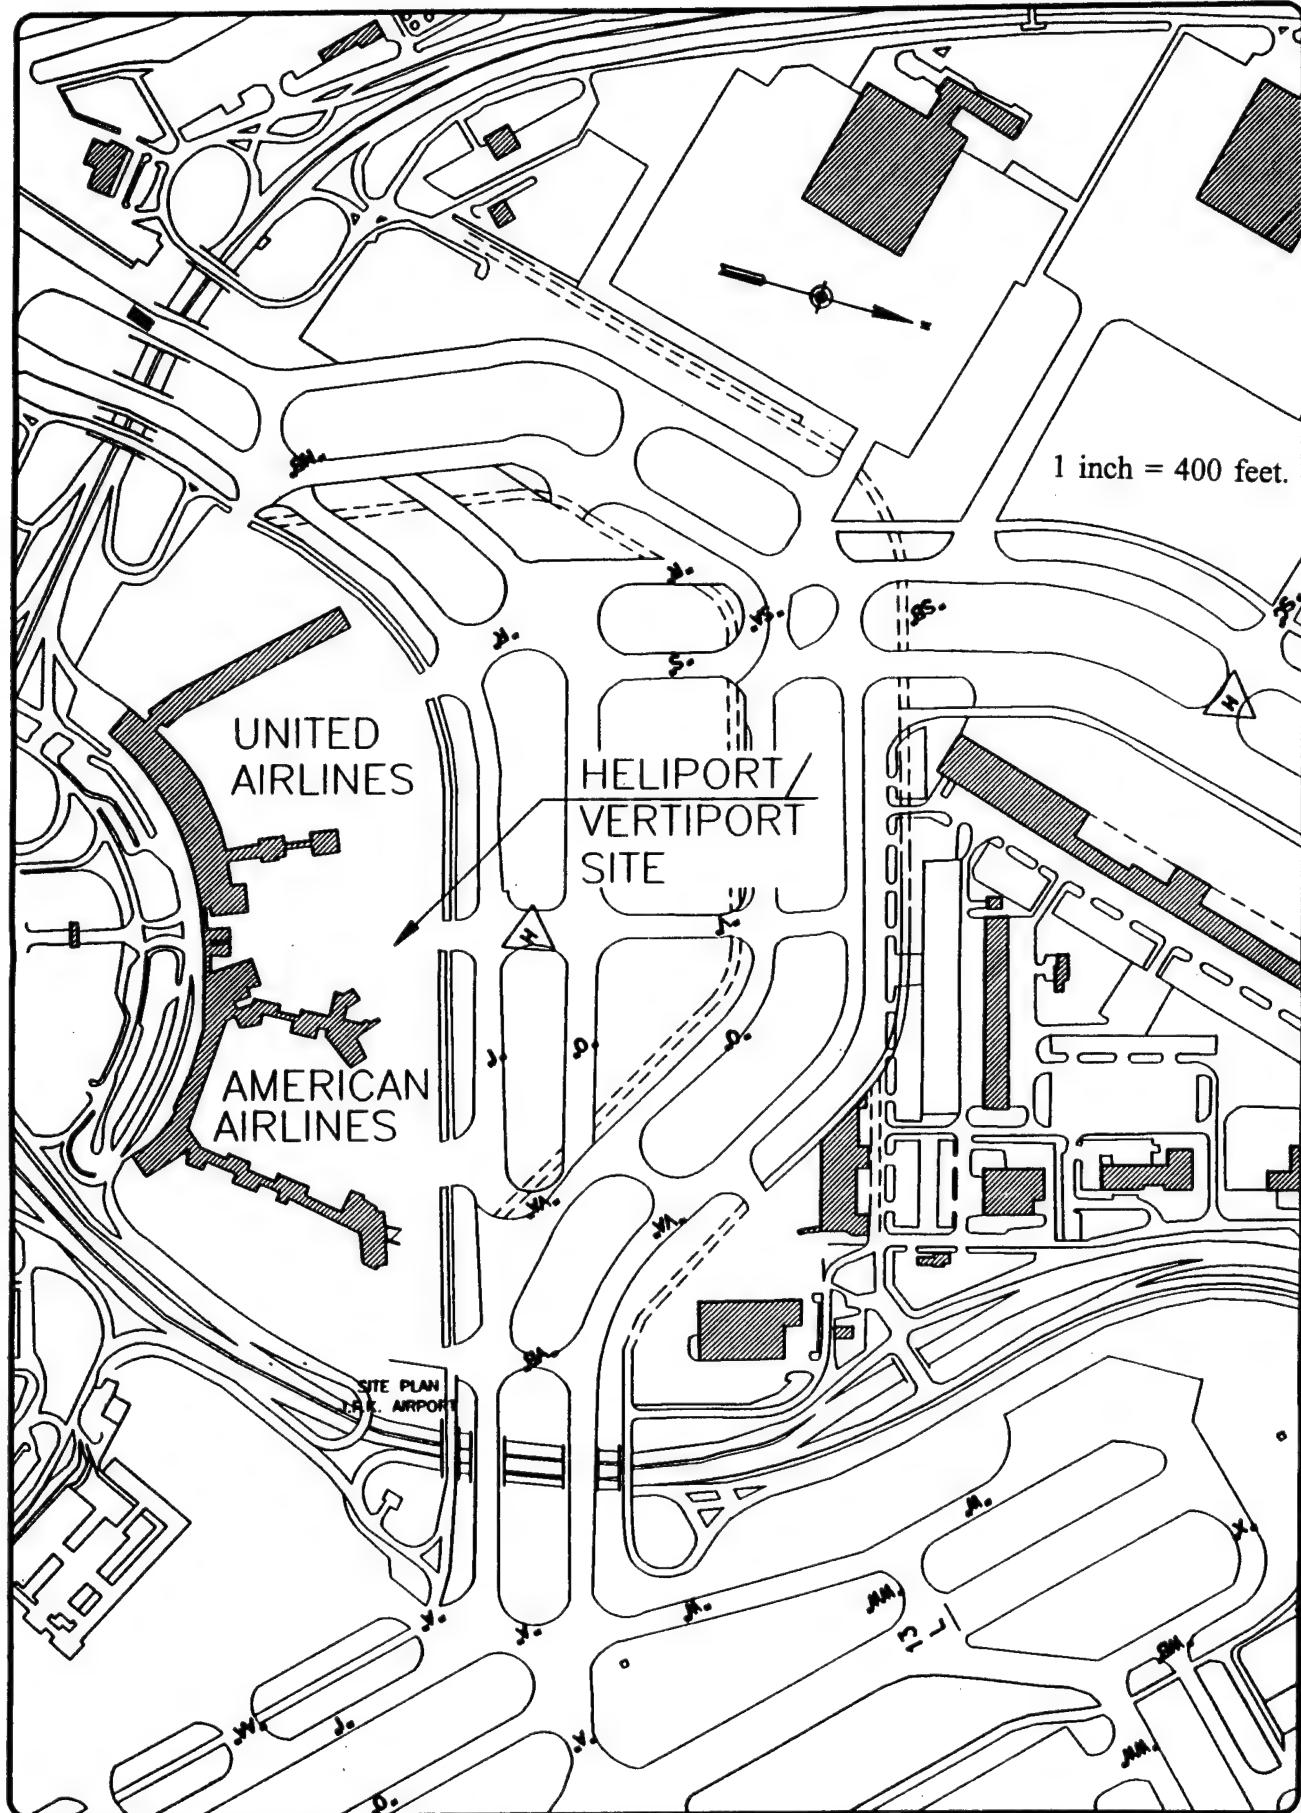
400 SCALE SITE 5 AT JFK, NEW YORK
